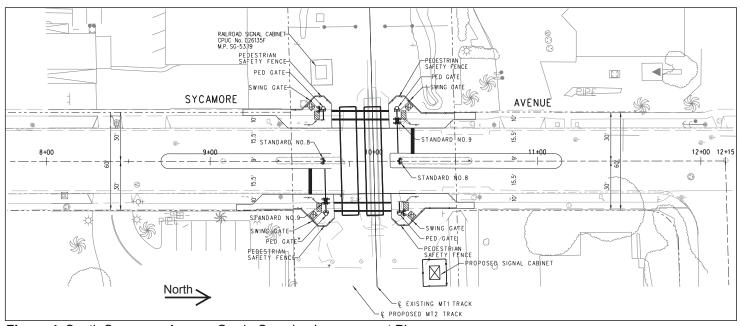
South Sycamore Avenue Grade Crossing Improvement Plan.
